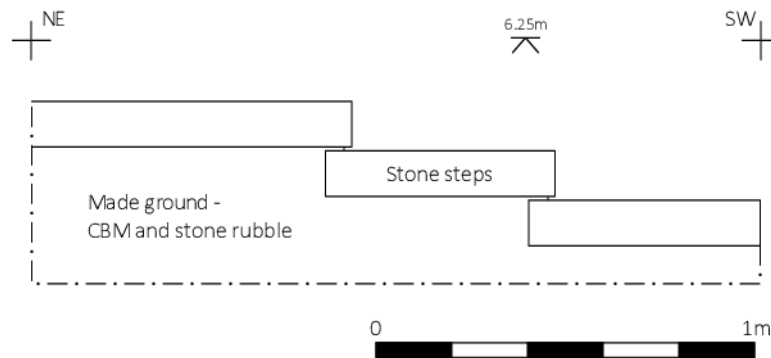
Northwest facing of the trench through the steps inside the north porch (scale 1:20)
